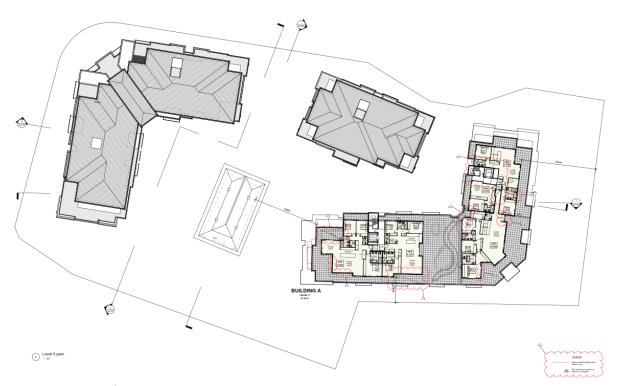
Pacific Lodge & Level 5 Floor Plan (Dwg No. A 2.07)
